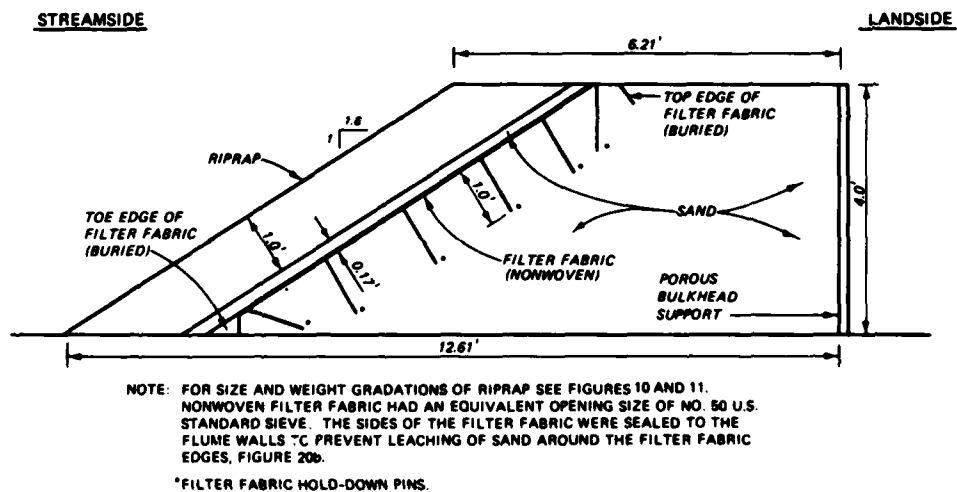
Plan 6B, sand streambank with 1.0 ft of riprap, 0.17 ft of sand and nonwoven filter fabric protection
